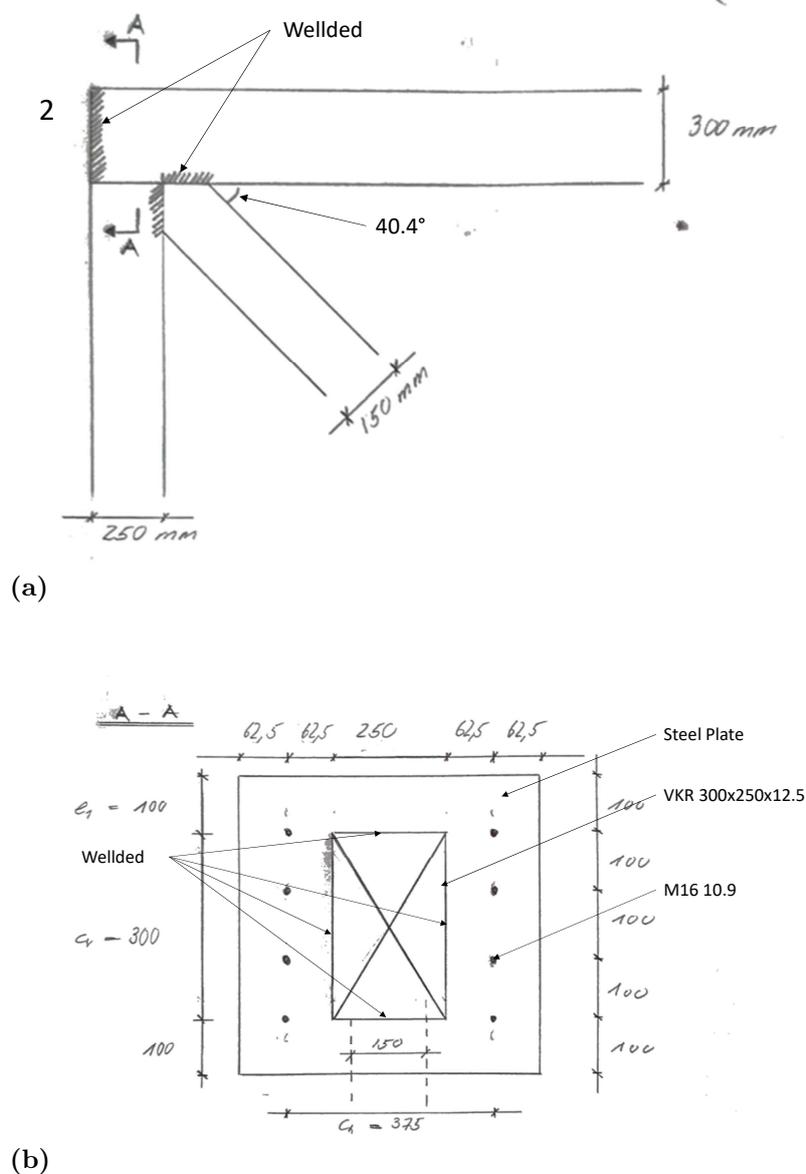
Dimensions and placements of the welds in node 2, see Figure 6.7.
